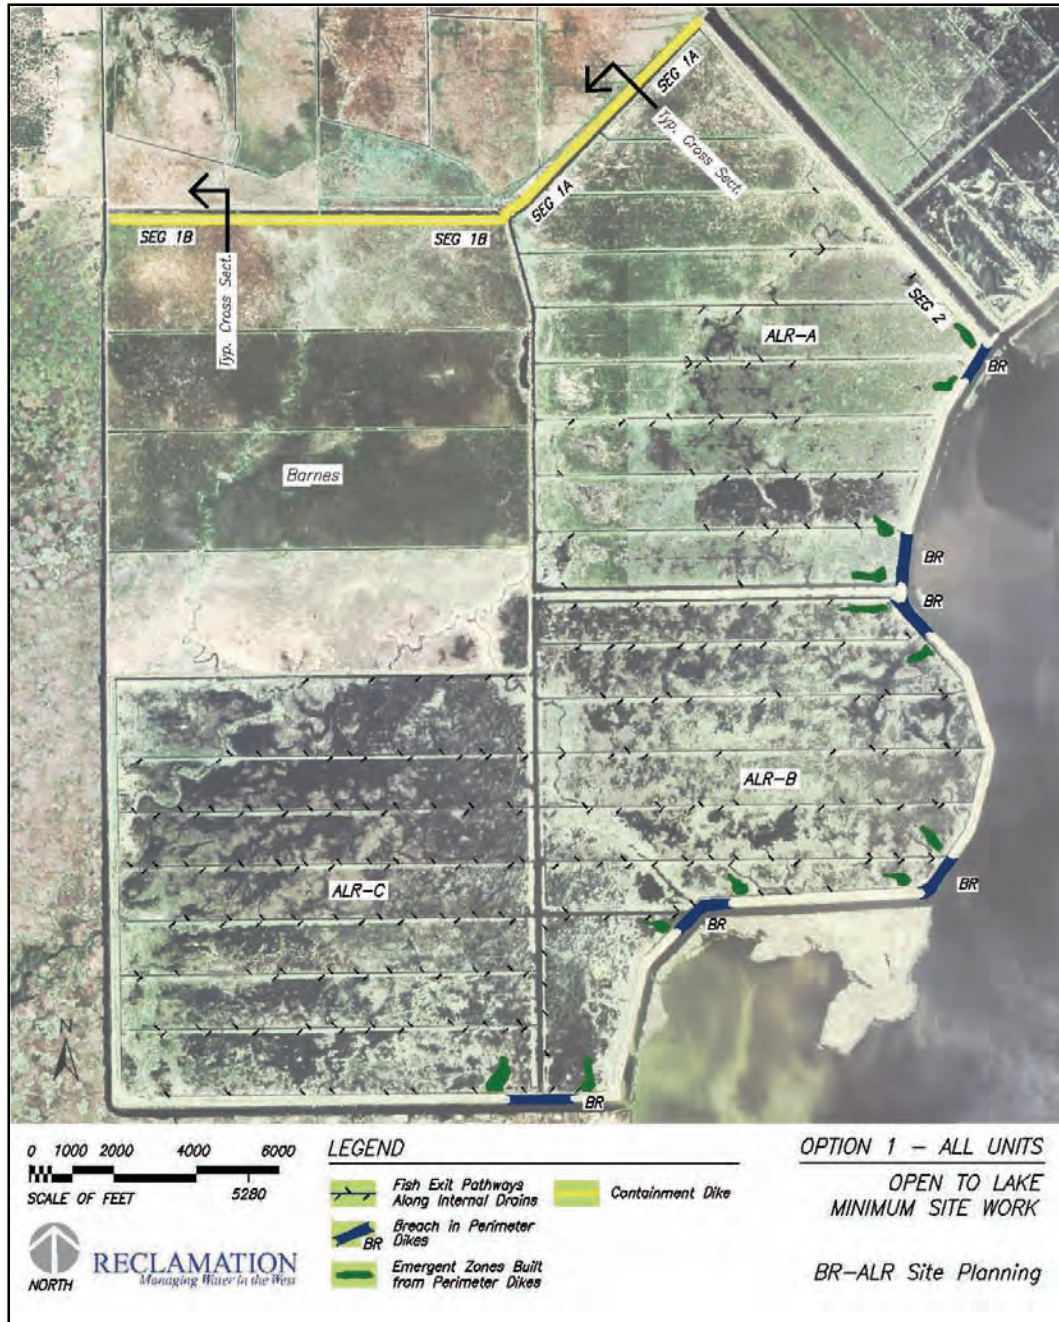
BR and ALR preliminary site layout showing Option 1—Open to lake with minimum site work required to breach perimeter dikes and construct internal site restoration features.
